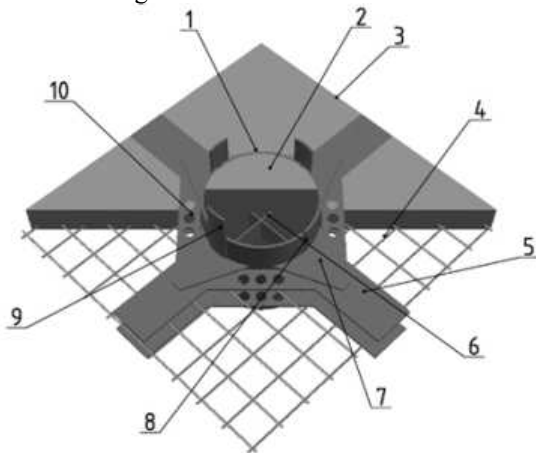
New construction form of rigid connection concrete filled tube column to reinforced concrete slab. 1 – concrete filled tube steel casing; 2 – concrete filled tube concrete; 3 – sitecast reinforced concrete slab; 4 – slab reinforced frames; 5 – external reinforcement steel plates; 6 – steel rigid element; 7 – steel connection plates; 8 – assembling slots in steel tube; 9 – vertical steel coating plates; 10 – steel tread plates.
